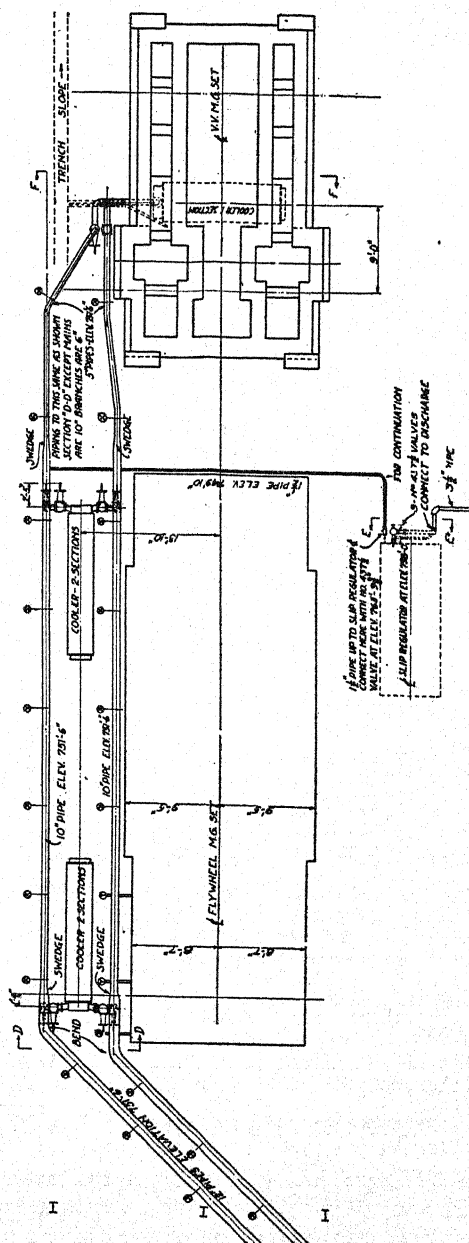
Final piping layout. This connects at "I-I" with sketch on page 877a.
